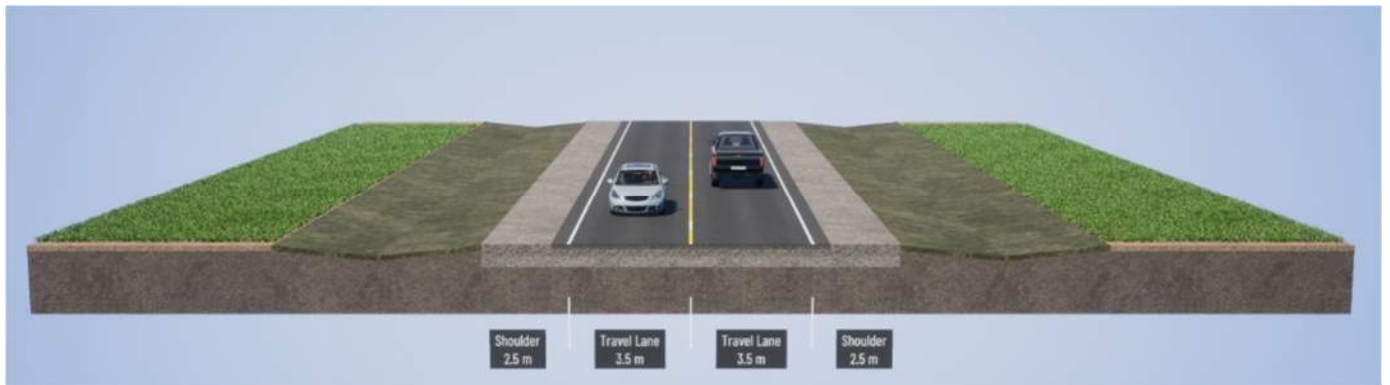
Dufferin County Road 3 Typical Cross Section
